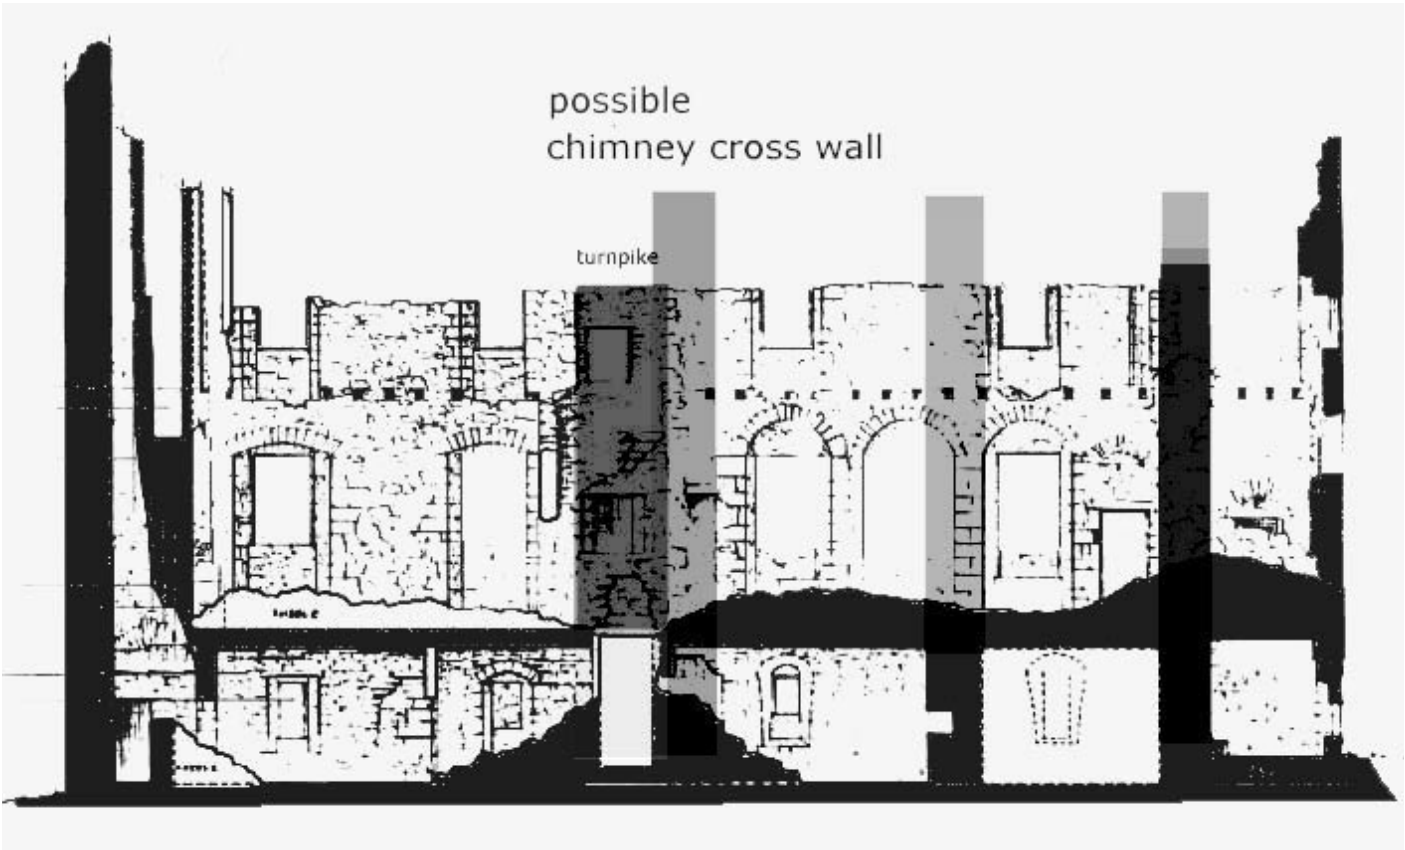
Original possible cross walls. Shows disconnection between the ground floor structure and the upper floors, implying huge remodeling.
